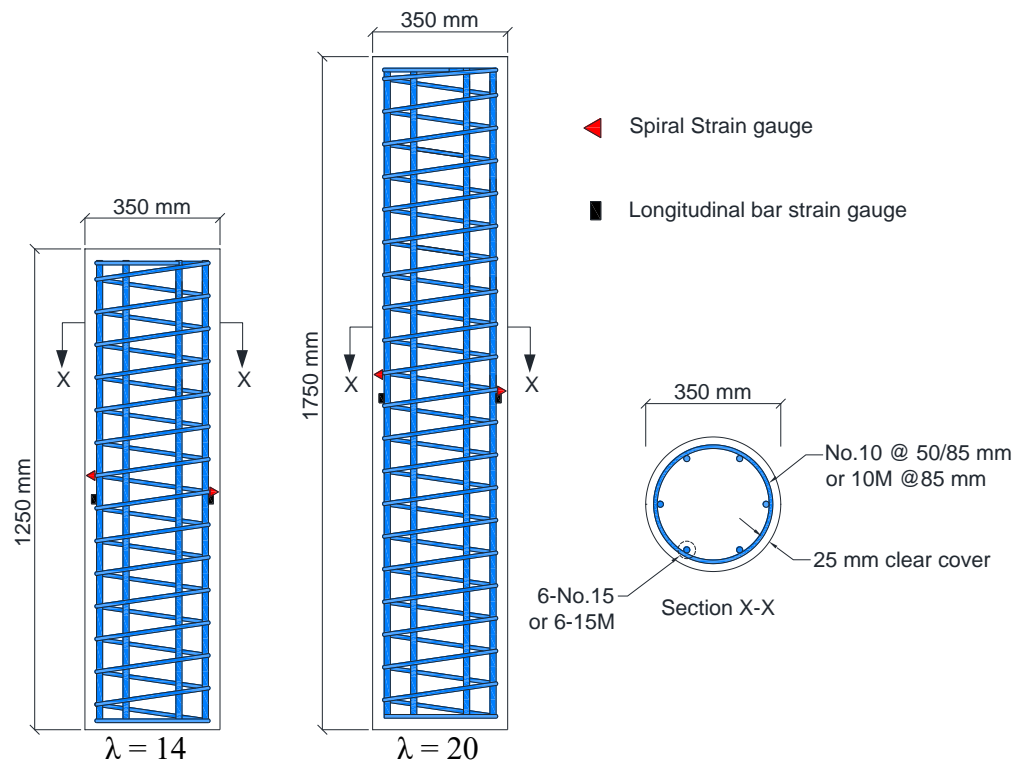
Specimens details, reinforcement configuration and internal instrumentation
